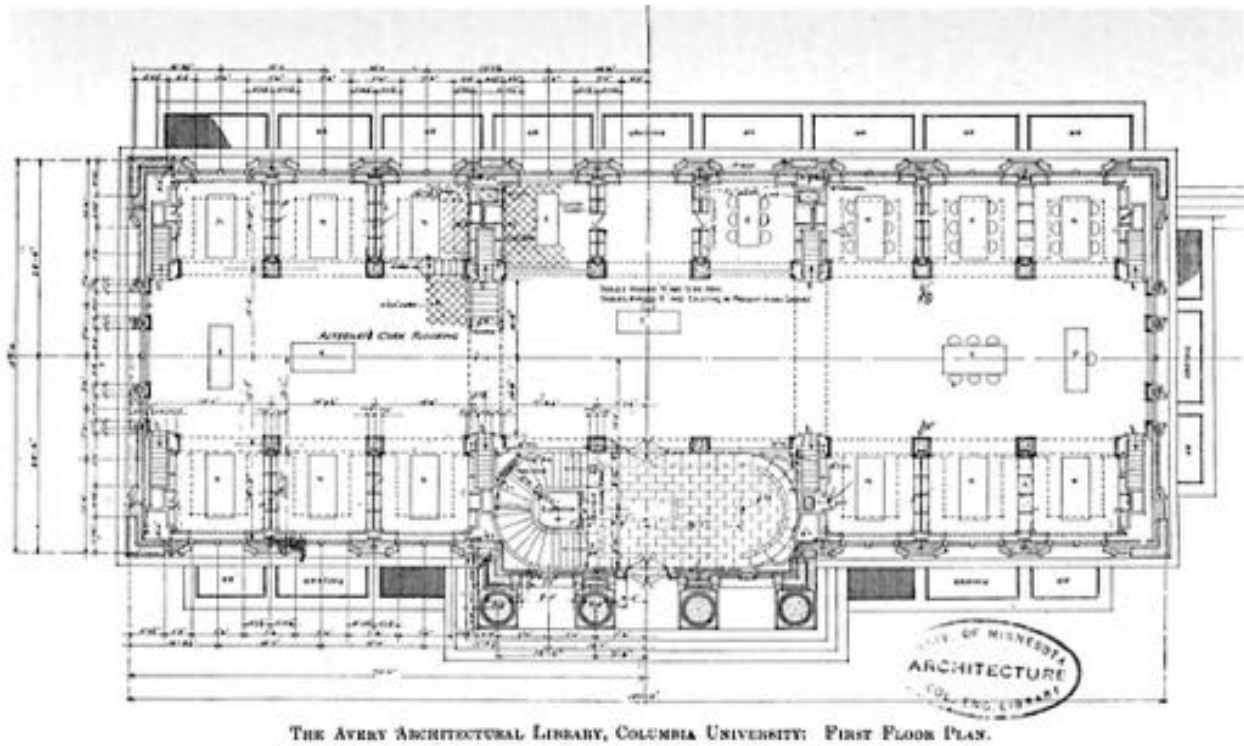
Avery Hall, first floor plan. From Smith (1914).
